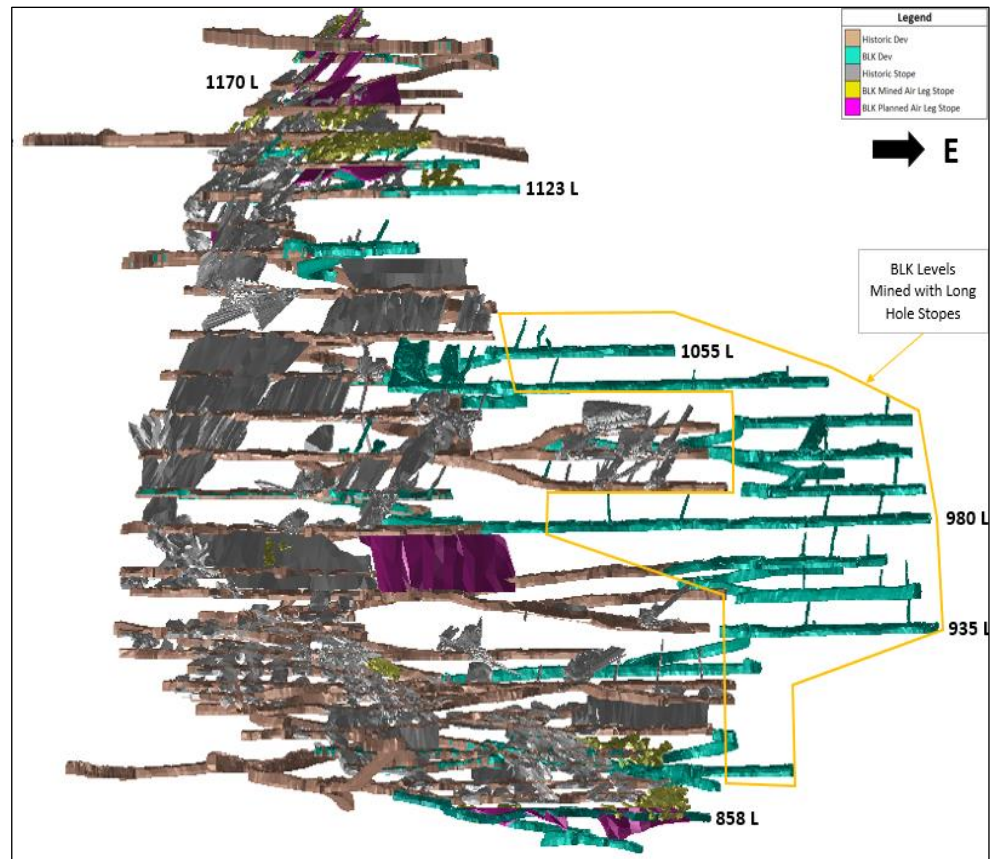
Golden Age Underground Mine Plan in purple and yellow
